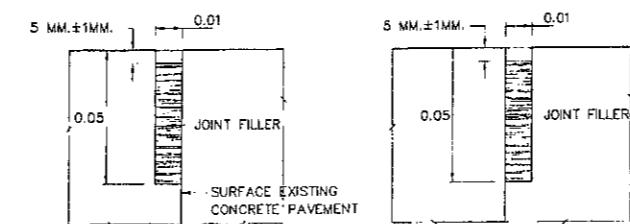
DETAIL OF SAWED JOINT FOR TRANSVERSE JOINT
